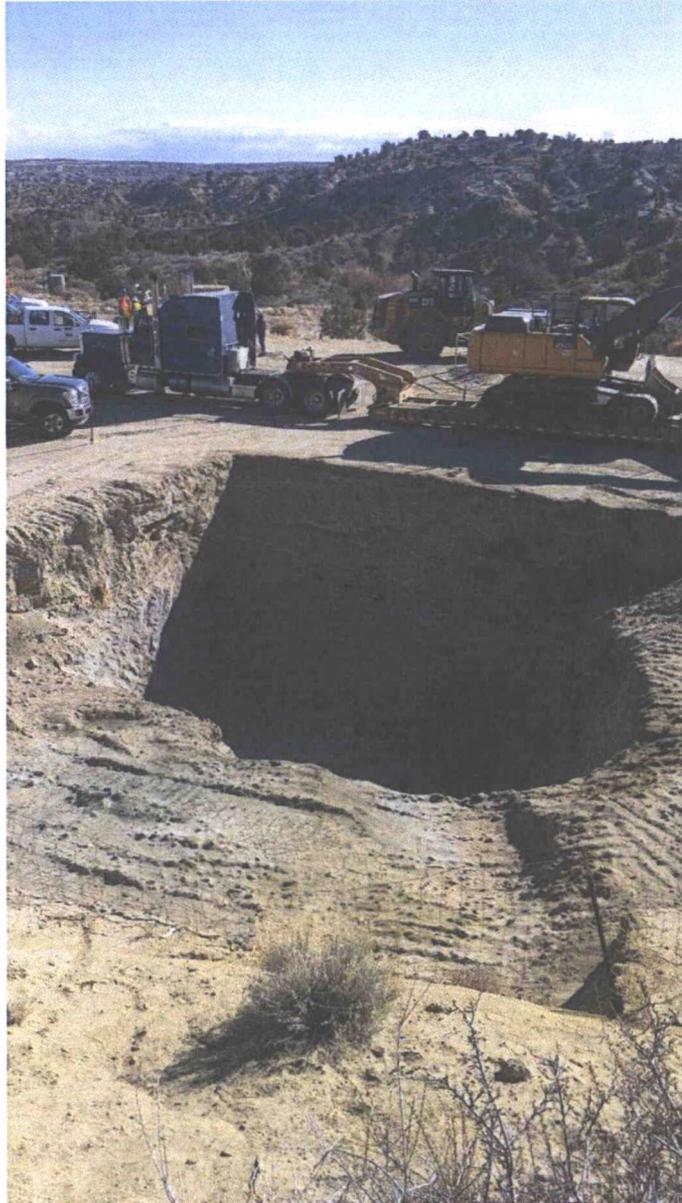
Krause WN Federal 2 Existing Excavation. Looking South.
